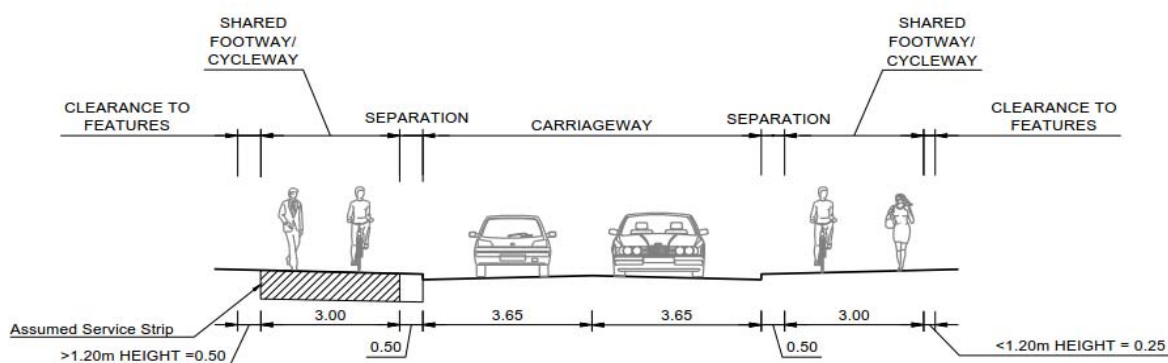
Indicative Road and Cycleway Cross Section showing cycleway on both sides of the roads*.
